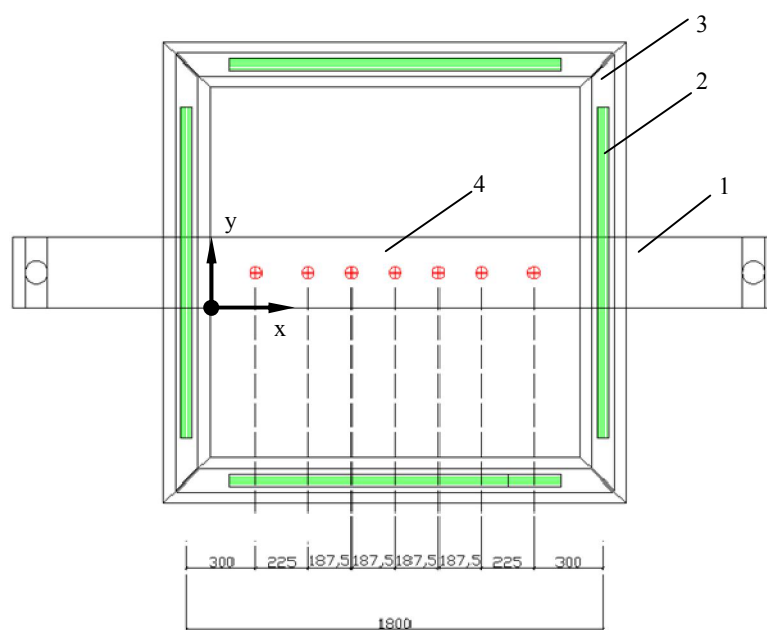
Arrangement of laser displacement sensors. 1. Specimen; 2. Solid steel pipe; 3. Support steel ring; 4. Laser displacement sensors (Total: 7)
